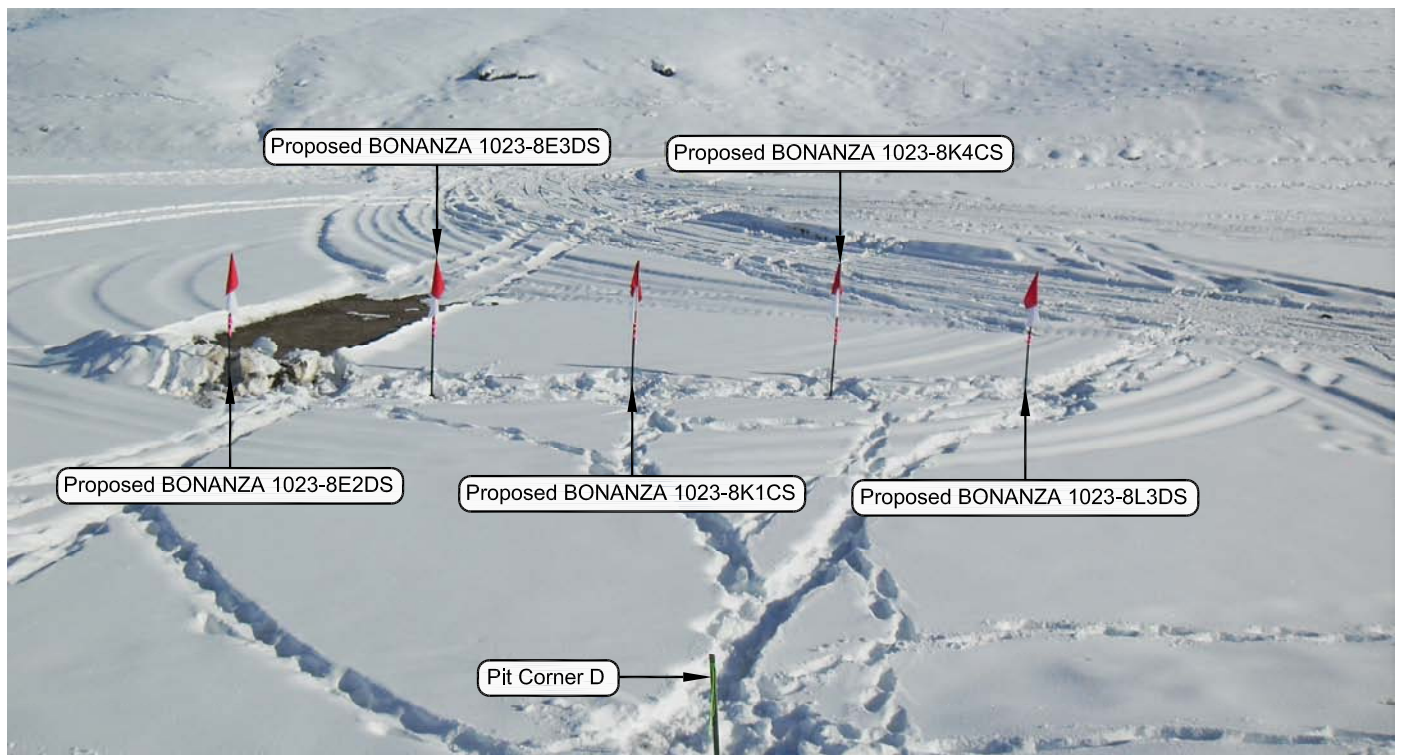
PHOTO VIEW: FROM PIT CORNER D TO LOCATION STAKES
